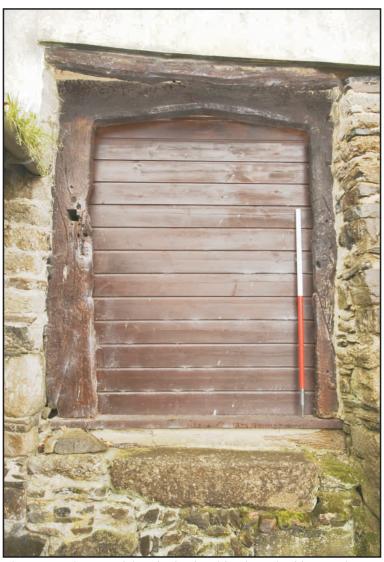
The reused door in the threshing barn, looking southwest. 1m scale.
